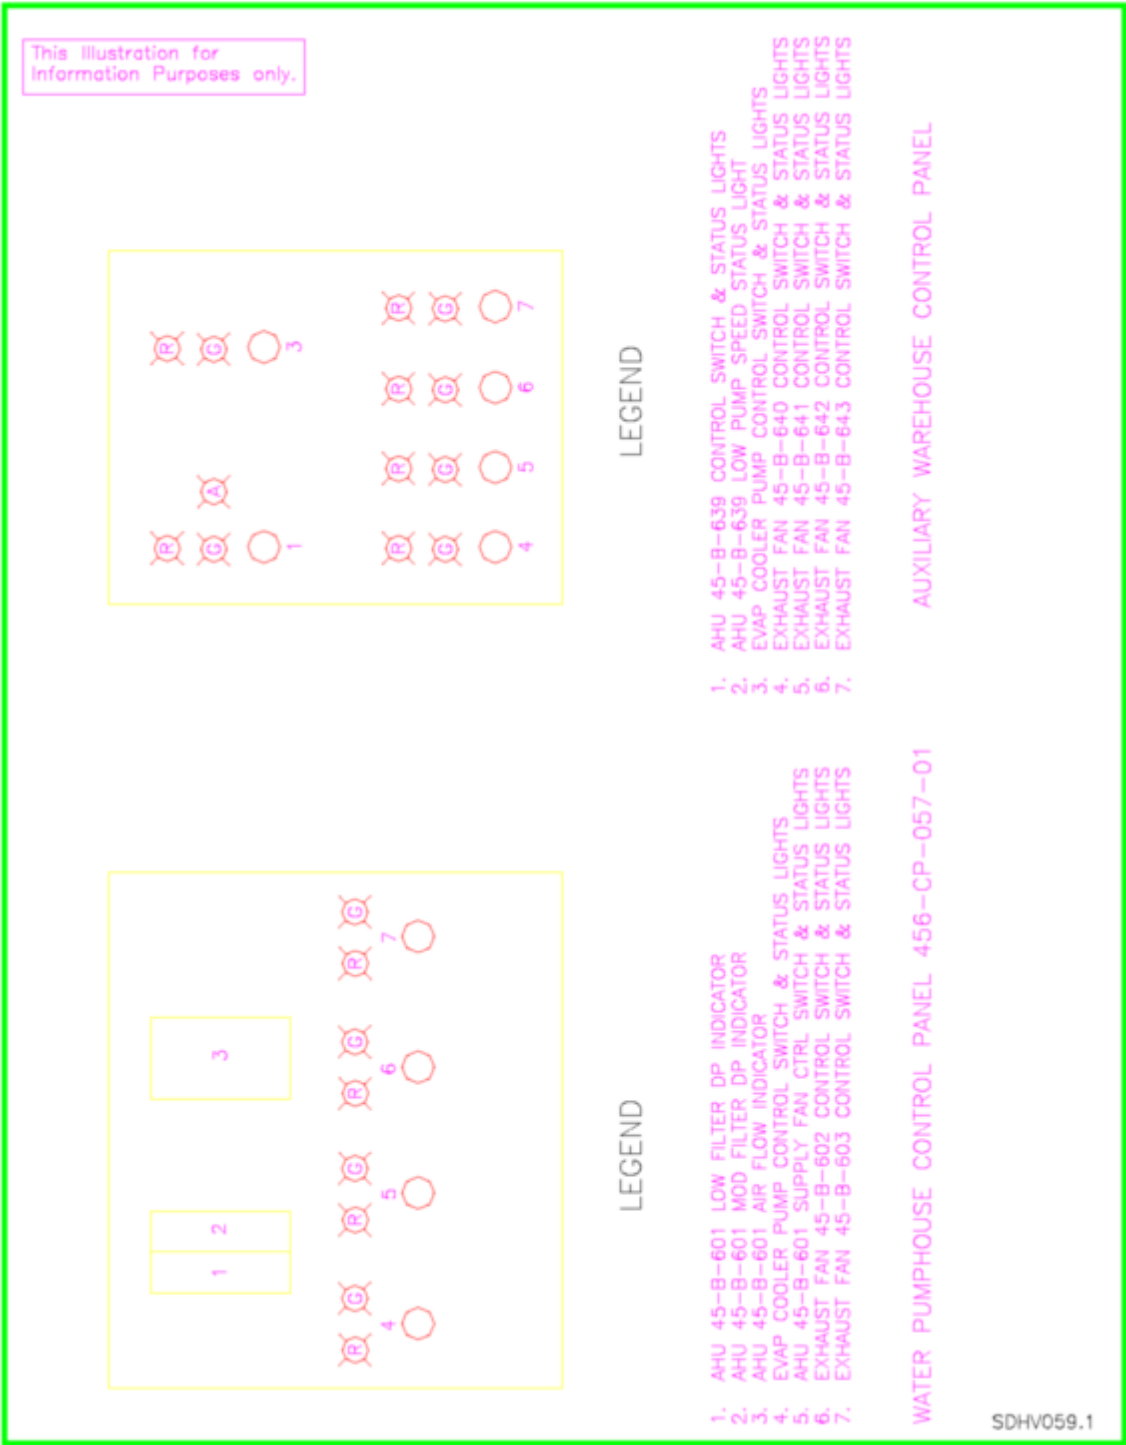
Water Pumphouse & Aux. Warehouse Control Panel Layout
